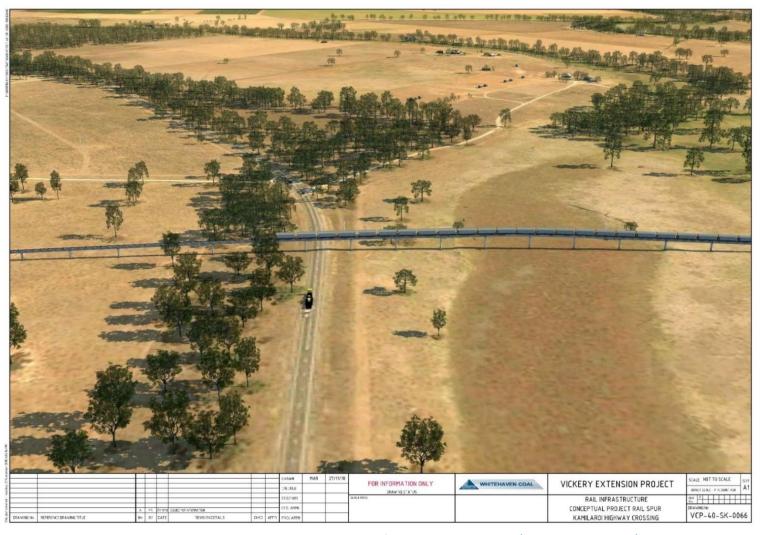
Conceptual Project Rail Spur Crossing of the Kamilaroi Highway (Source: Whitehaven)
